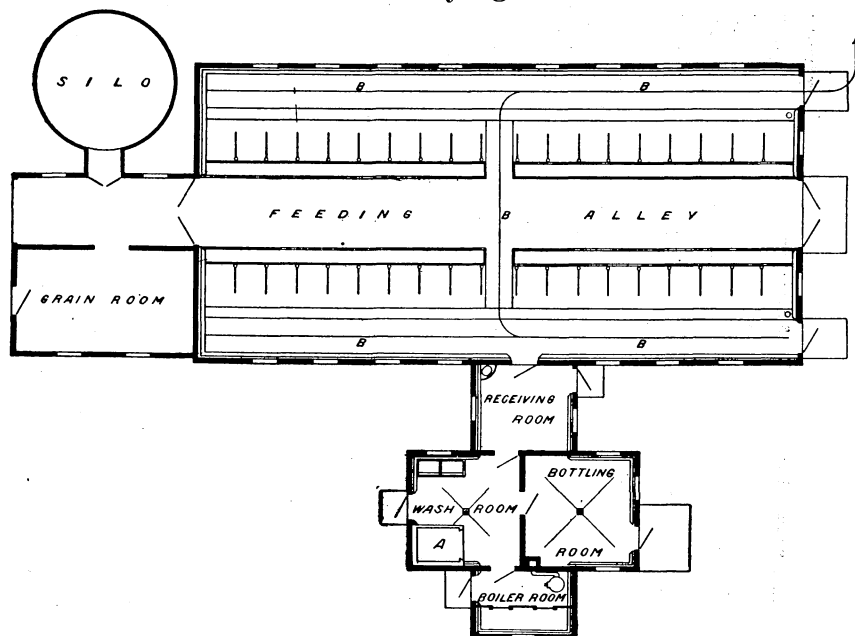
Floor plan of stable for 36 cows, with semidetached milk house.
